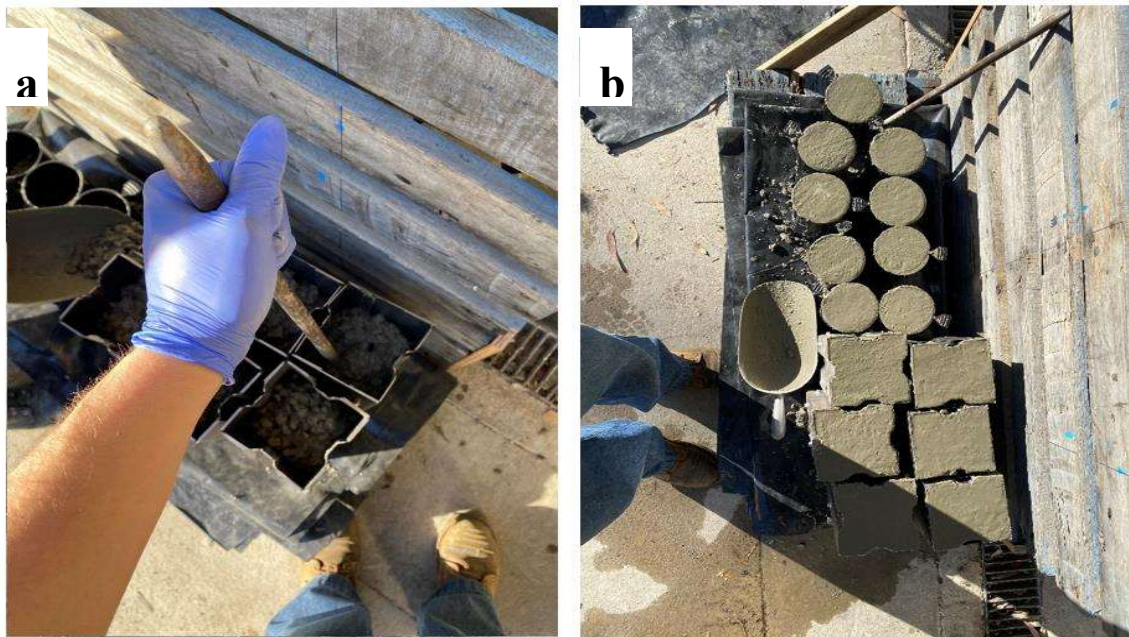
(a) Tamping of concrete to specimen (b) Specimens post concrete pour.
